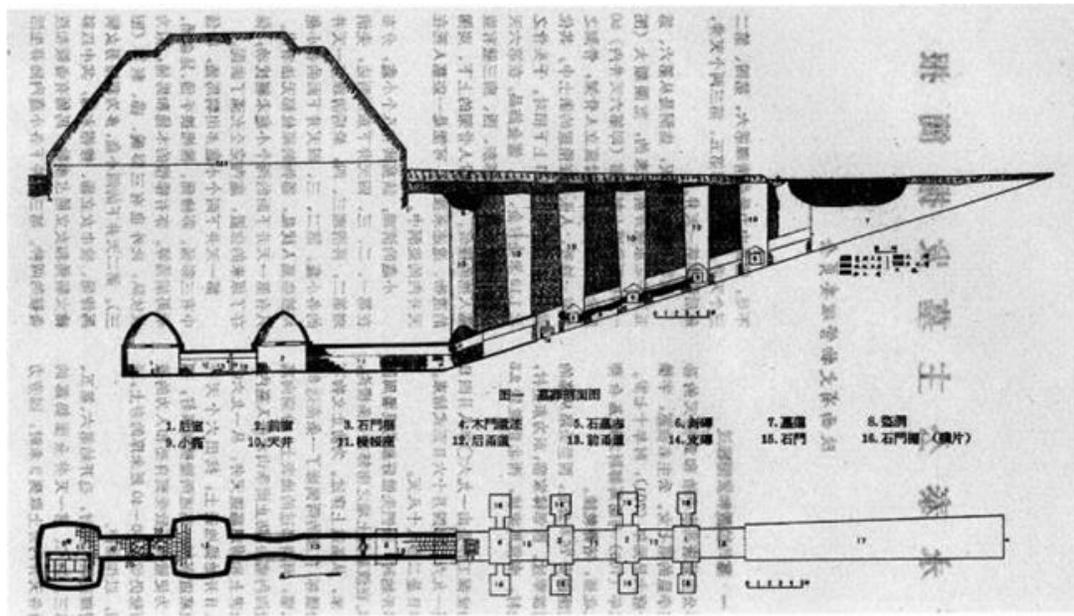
Plan and section of Princess Yongtai’s tomb, 1964. “A Study on the Style and Maid’s Image of Princess Yongtai’s Wall Painting.”
